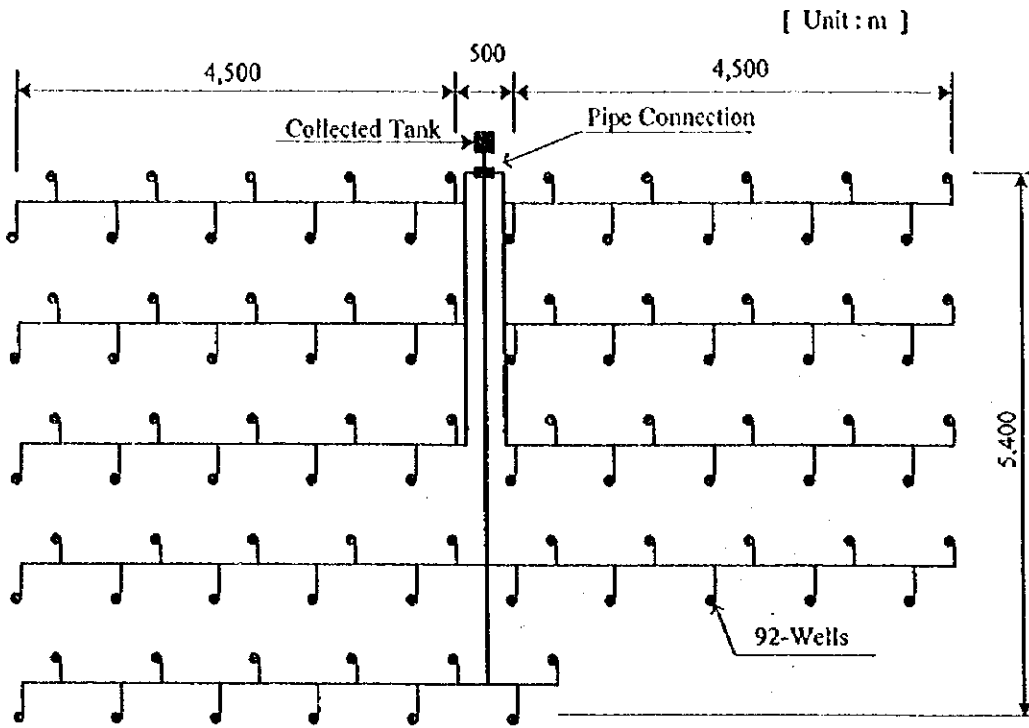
(1) Layout of Well Field (Plan1)
